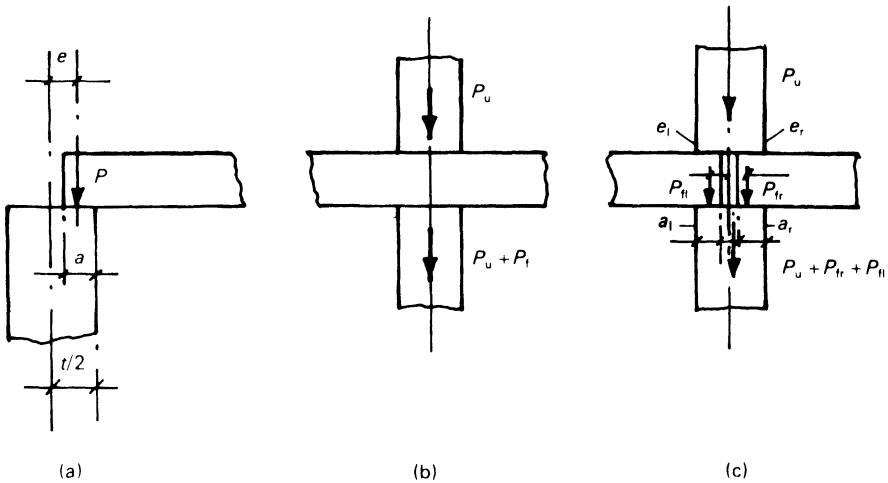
Typical assumed eccentricities in conventional analytical model: (a) slab simply supported on wall, $e = t/2 - a/2$ or $a/3$; (b) continuous floor slab, floor load P_f much smaller than P_u , $e = 0$; (c) discontinuous slabs, eccentricity of $P_u = 0$, $e_l = a_l/2$, $e_r = a_r/2$, eccentricity of load on lower wall is calculated from these assumed eccentricities
